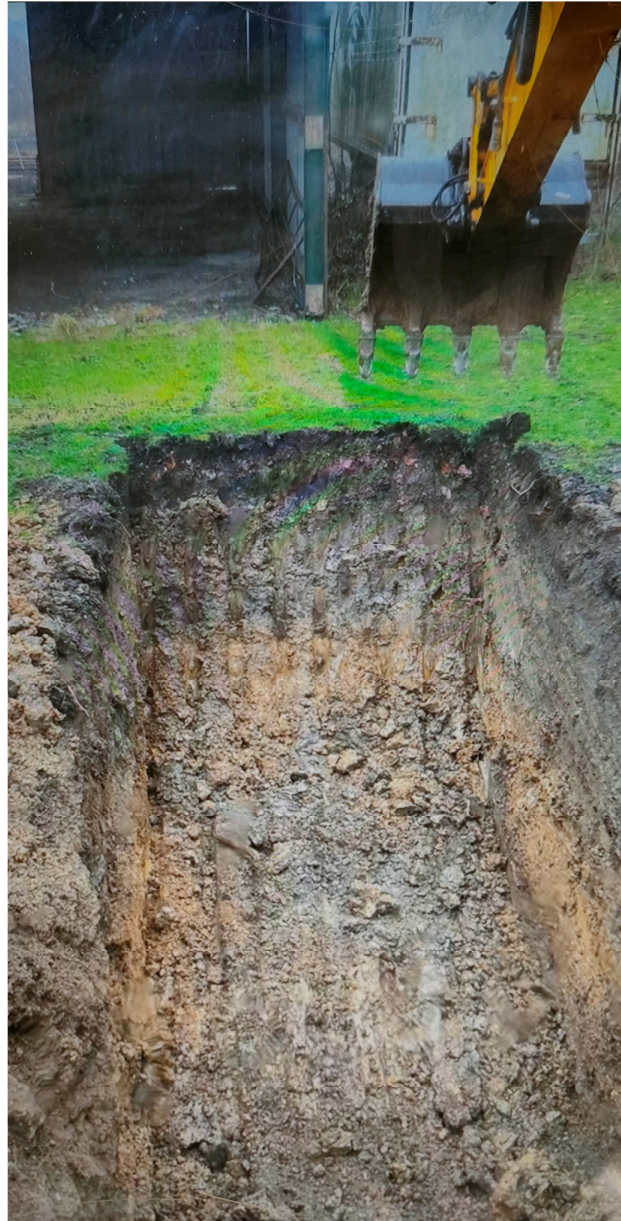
Looking north, from southern boundary, shaft scrape excavated to rockhead.
